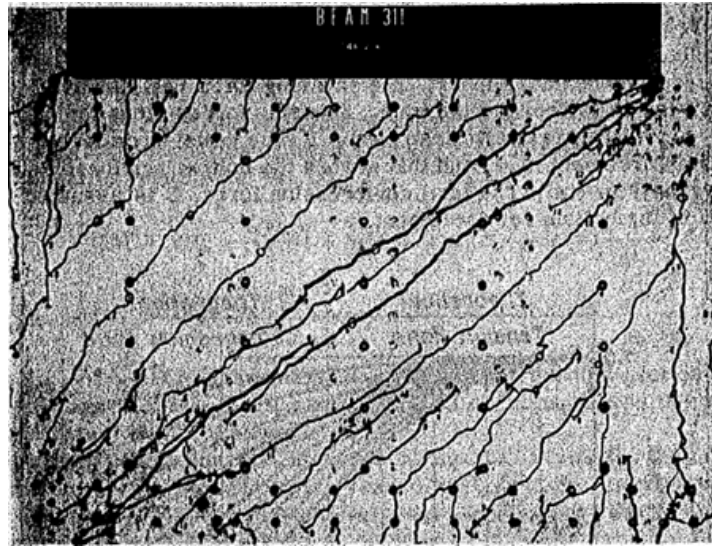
Crack pattern for beam with shear reinforcement ratio less than 1.65%
